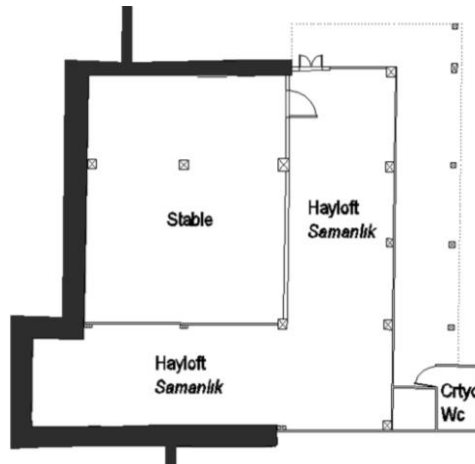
, Plan layout of Basement Floor of a Vernacular *Uzungöl* House³⁸
